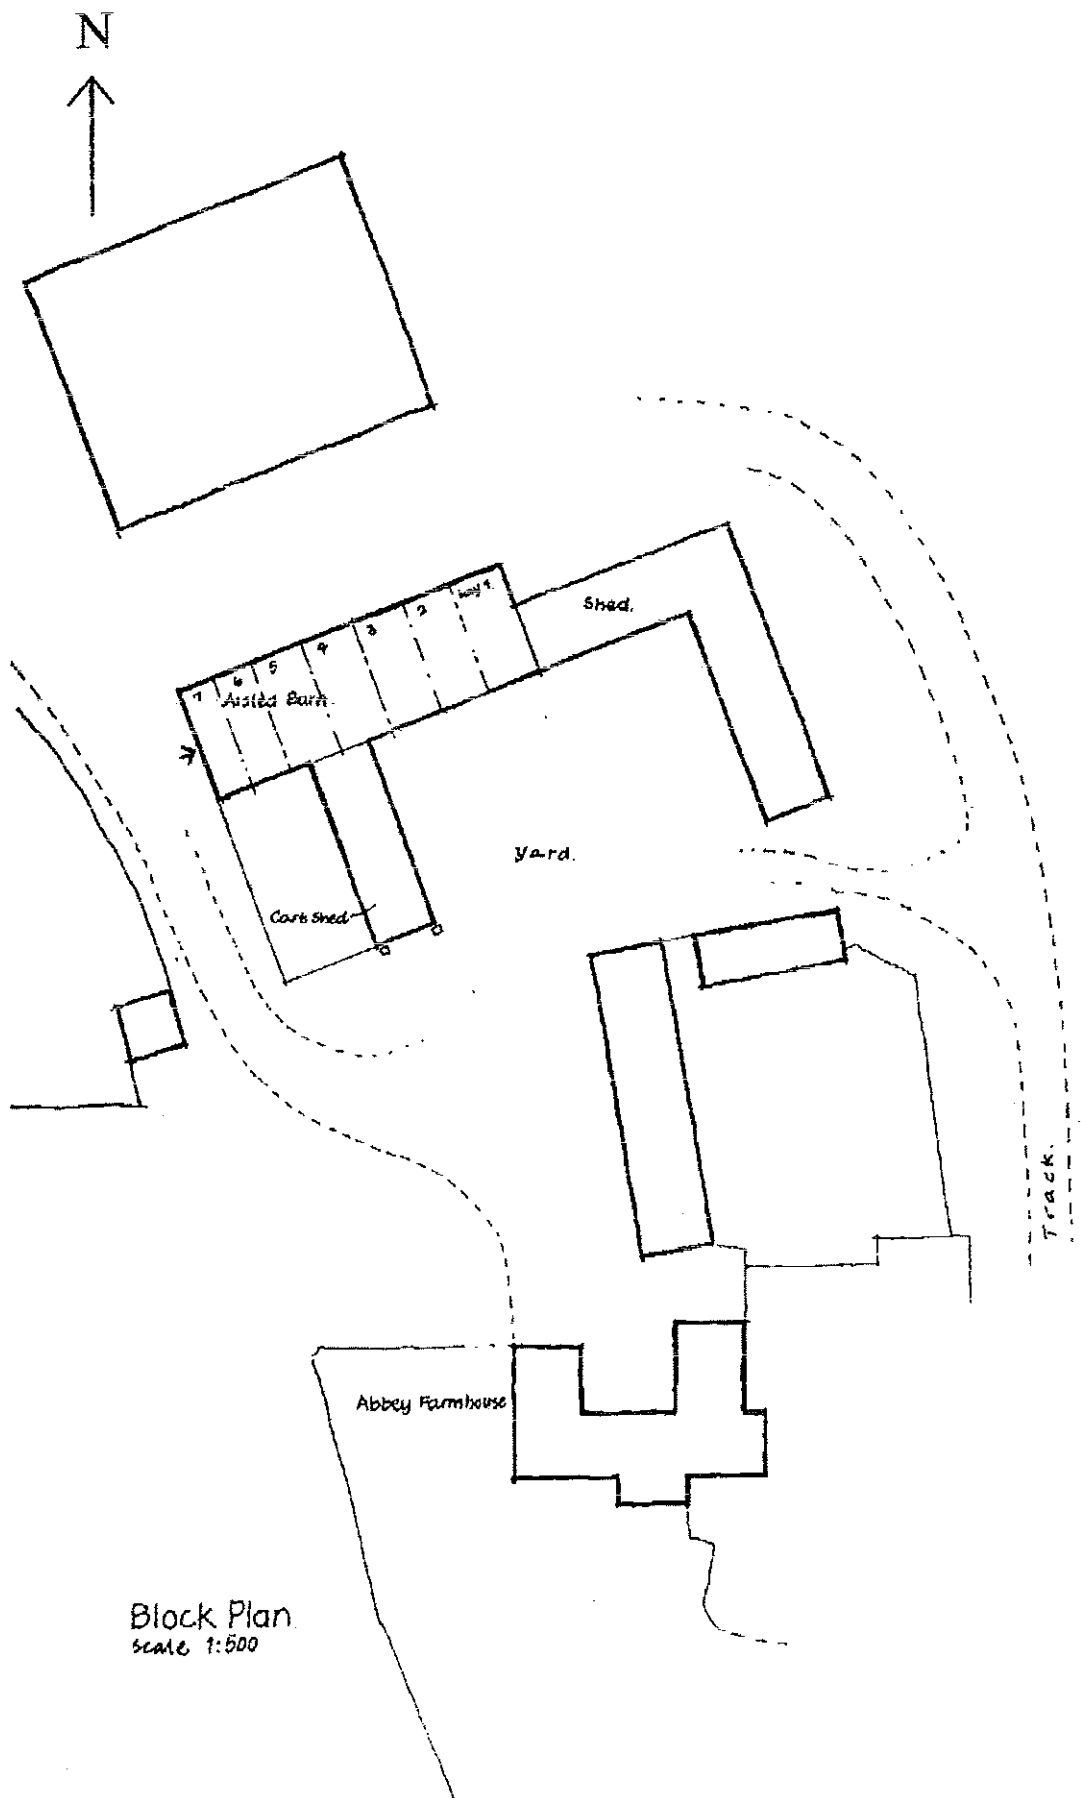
Site plan of Abbey Farm, Snape, showing the relationship of the aisled barn to other buildings on the site
